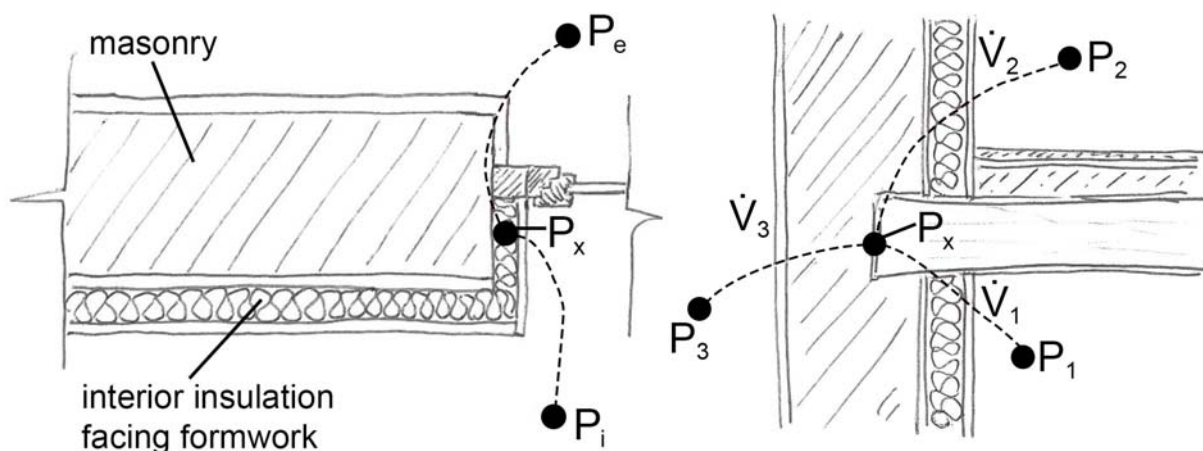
left: reveal with facing formwork as interior insulation; right: ceiling-to-wall connection with facing formwork as interior insulation
